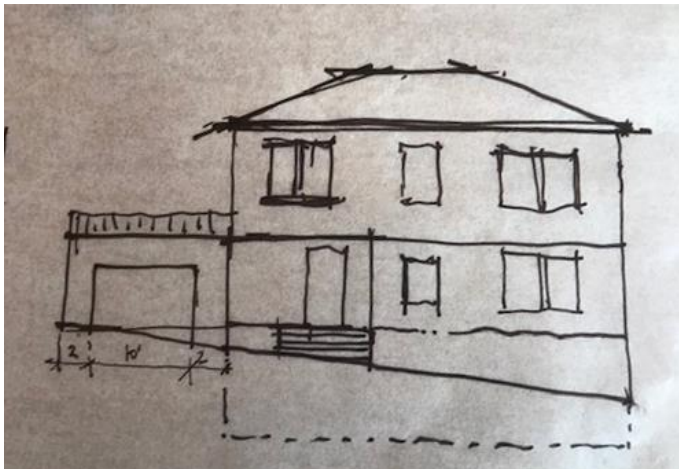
Design team meeting 8/4/20 - Drawing of acceptable massing and roof line
